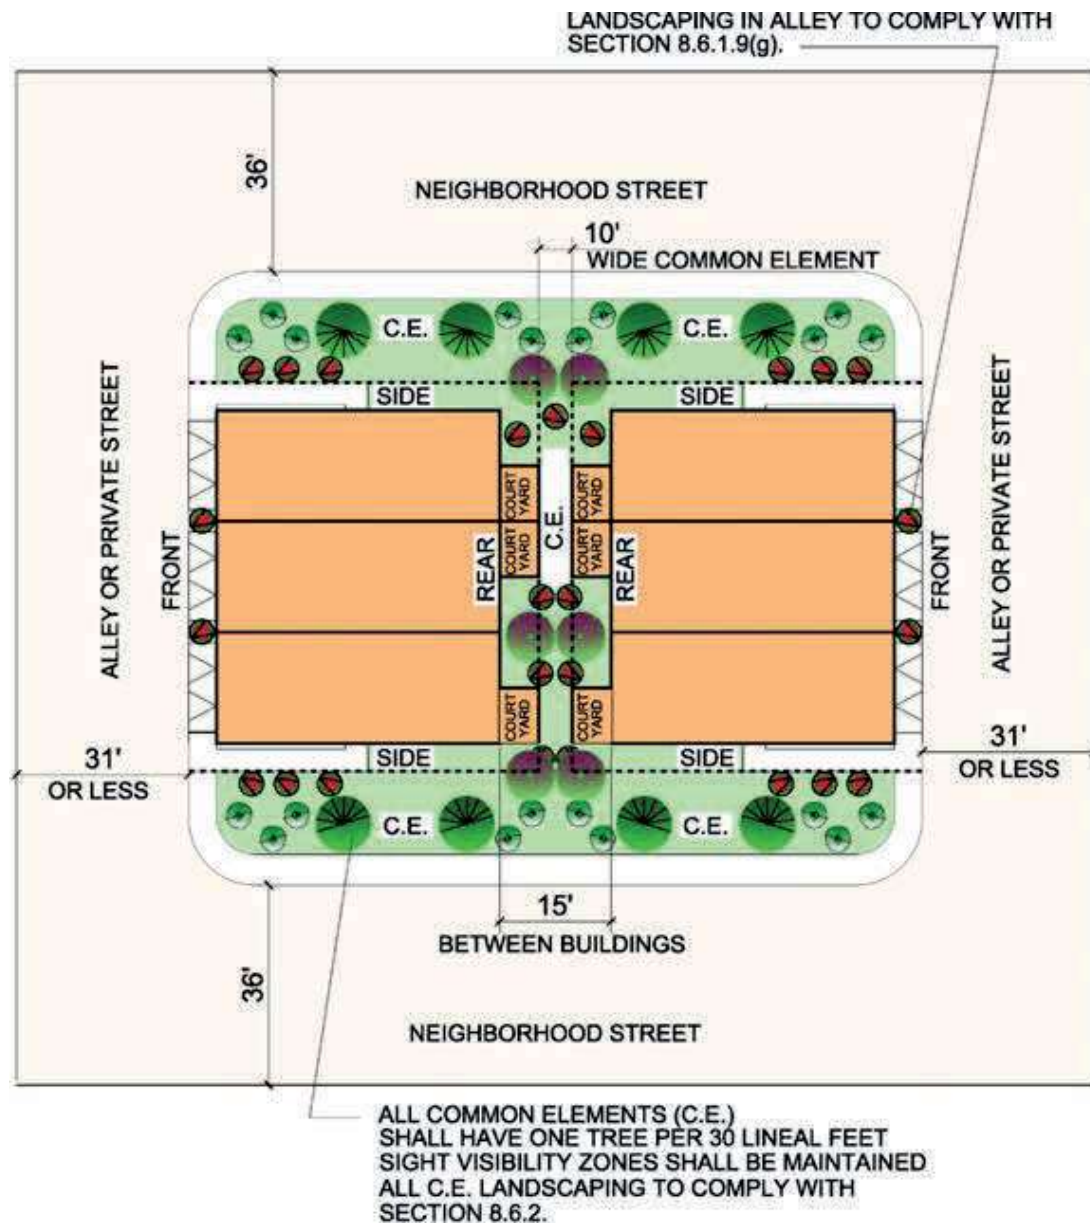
TYPICAL CORNER LOT, 60' LOT
